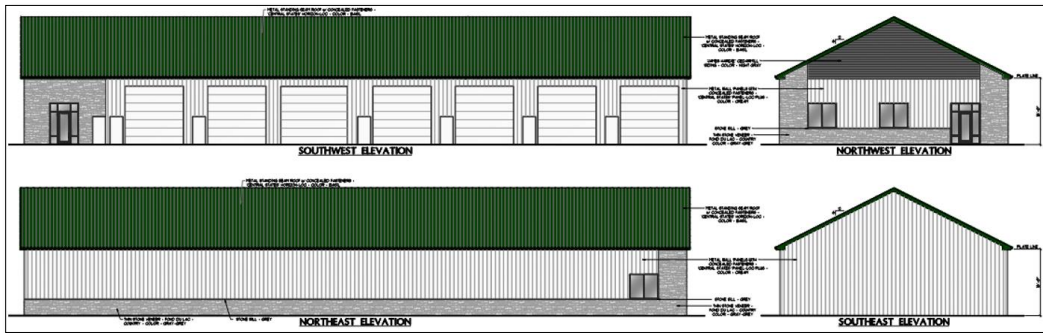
Proposed elevations for the office and mini-warehouse storage building.
